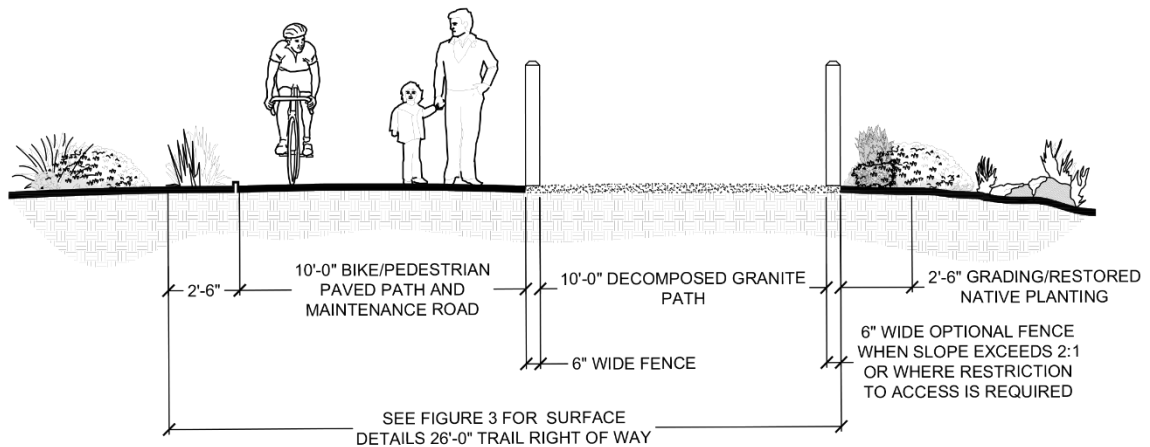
TRAIL DESIGN STANDARDS
